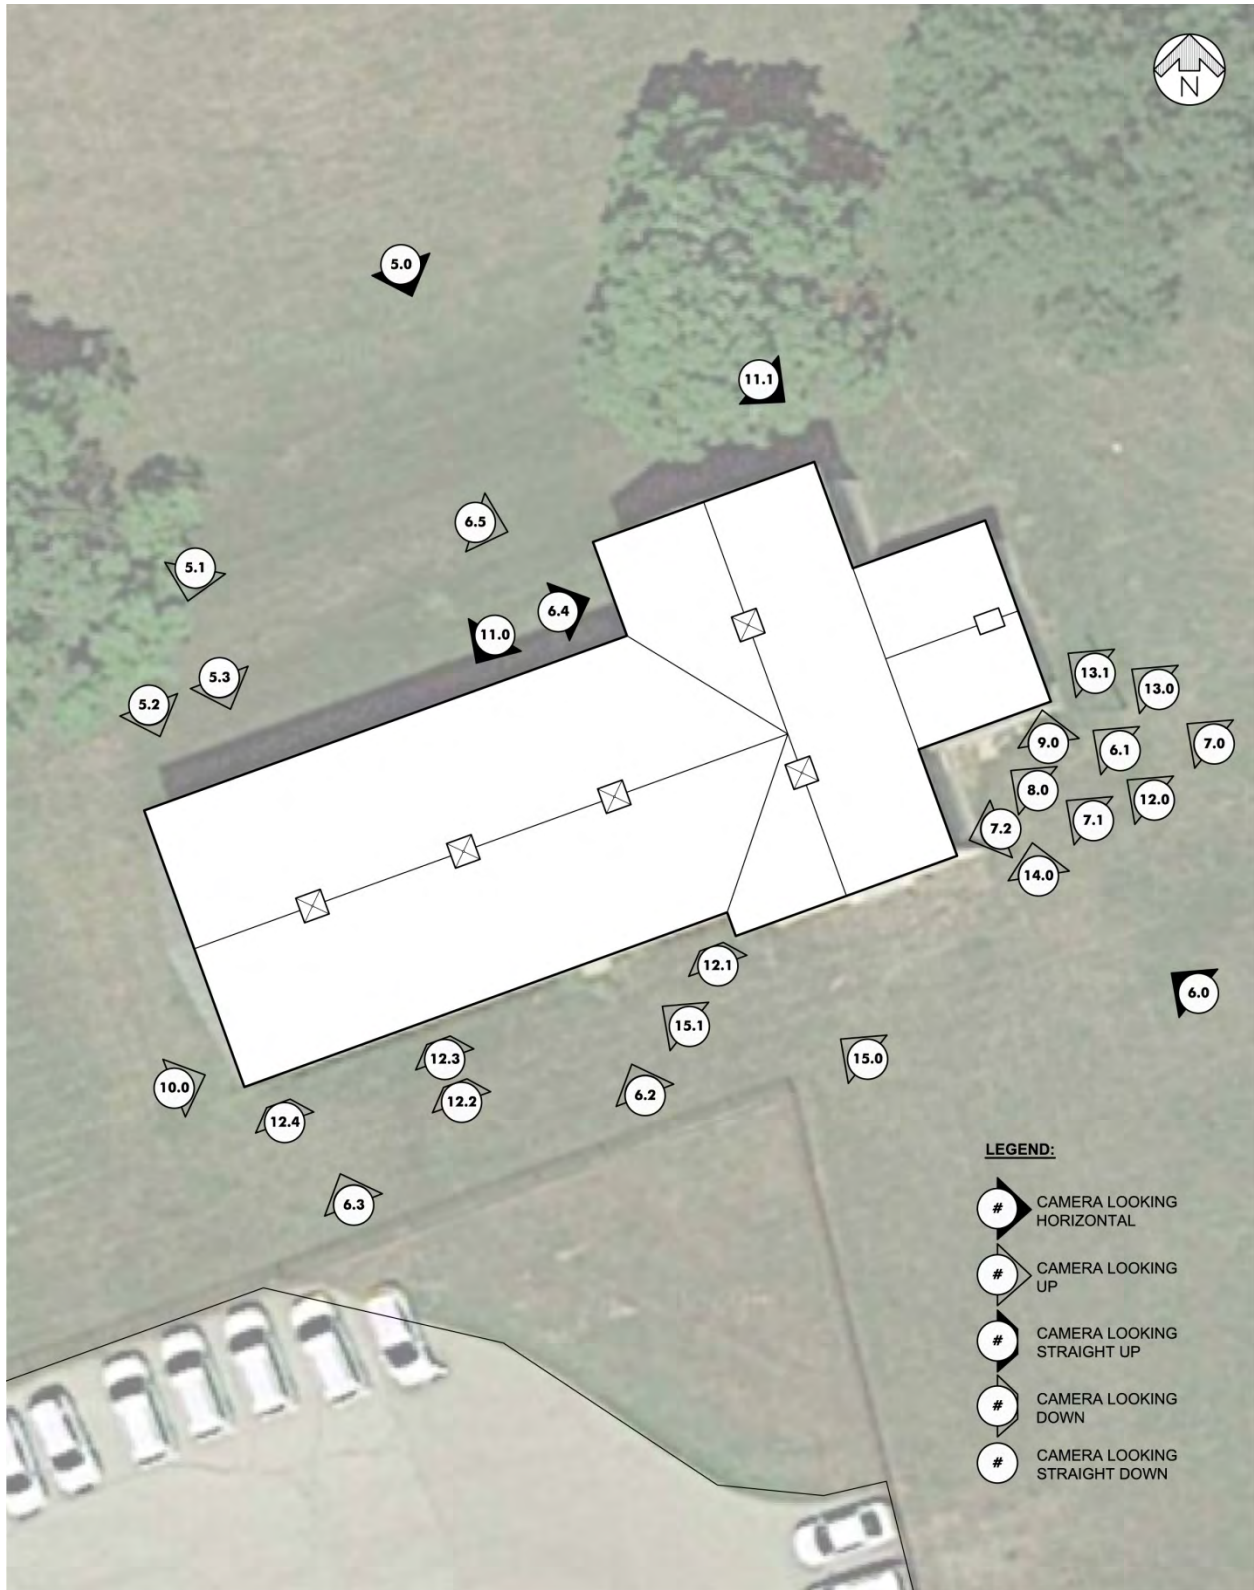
Photo No. 5.0 – 15.1 (Roof, Roof Elements, Rainwater, Chimney and Ventilators)
